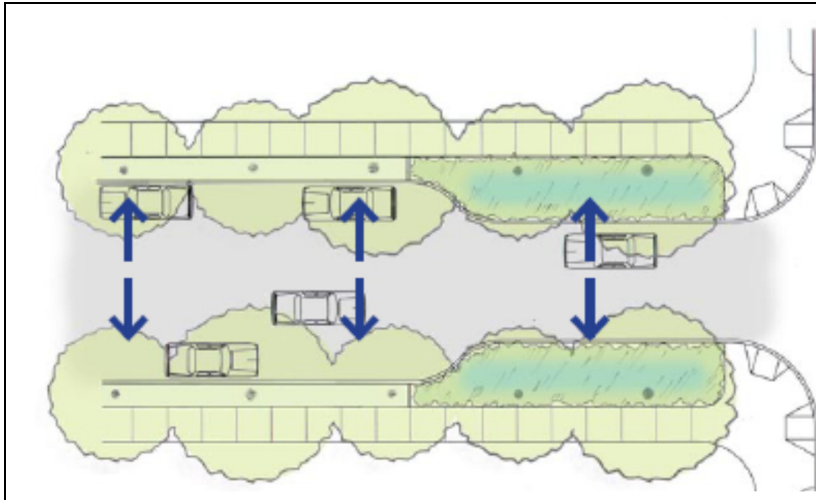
Crowned Street Profile. A crowned street is designed so that the highest elevation is in the middle of the street, such that stormwater runoff drains to the sides of the street. GI facilities may be located on either side of the street.
